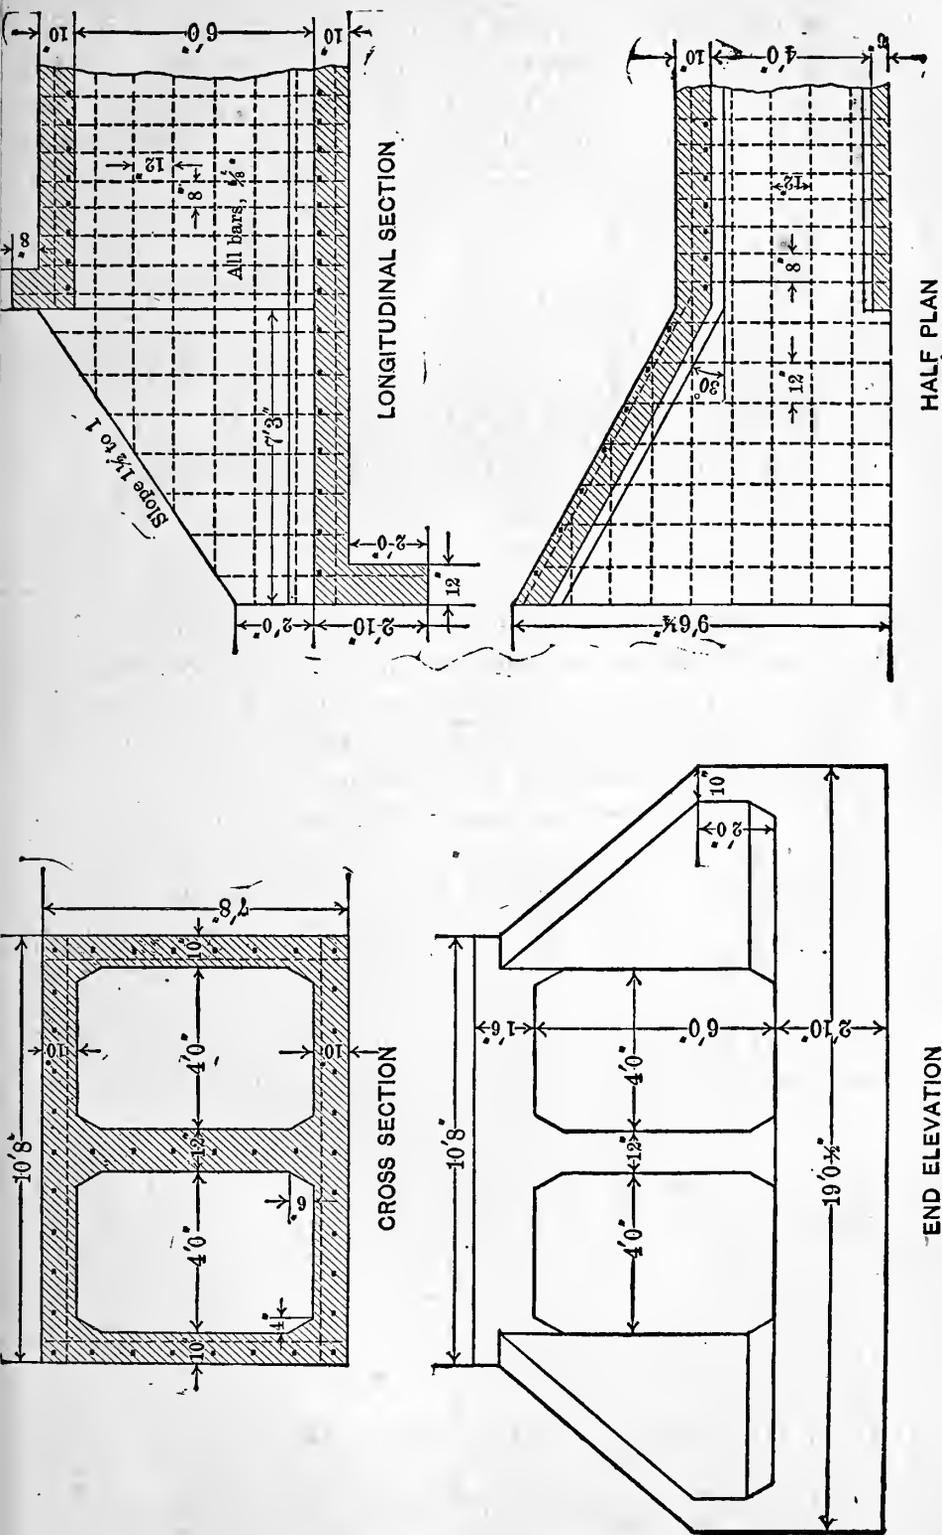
REINFORCED CONCRETE BOX CULVERT.
